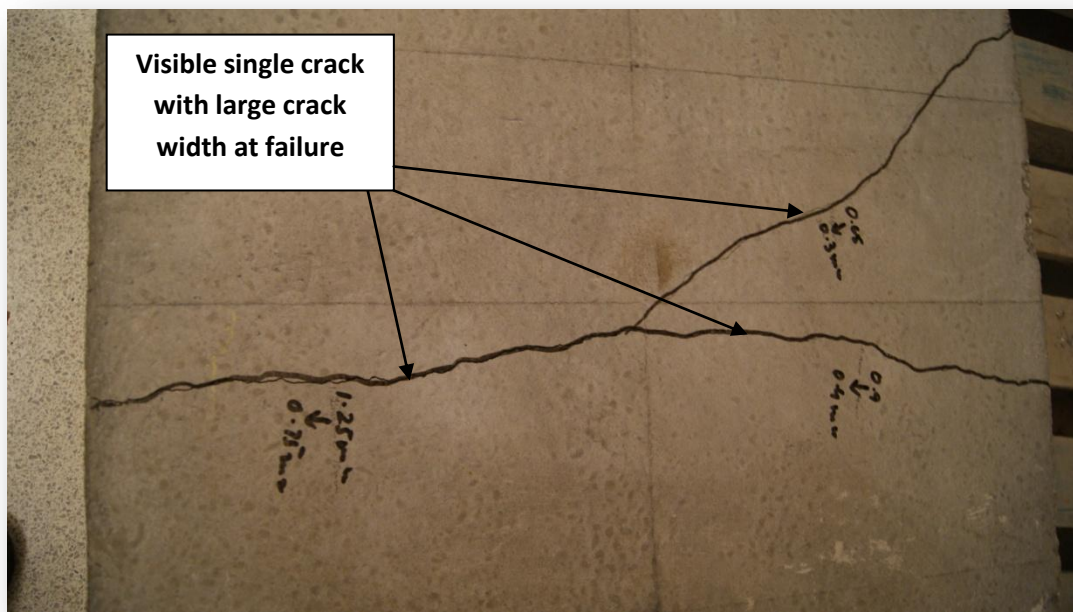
Crack development and crack propagations in SCC 350 specimen at the inner edges of the wall
